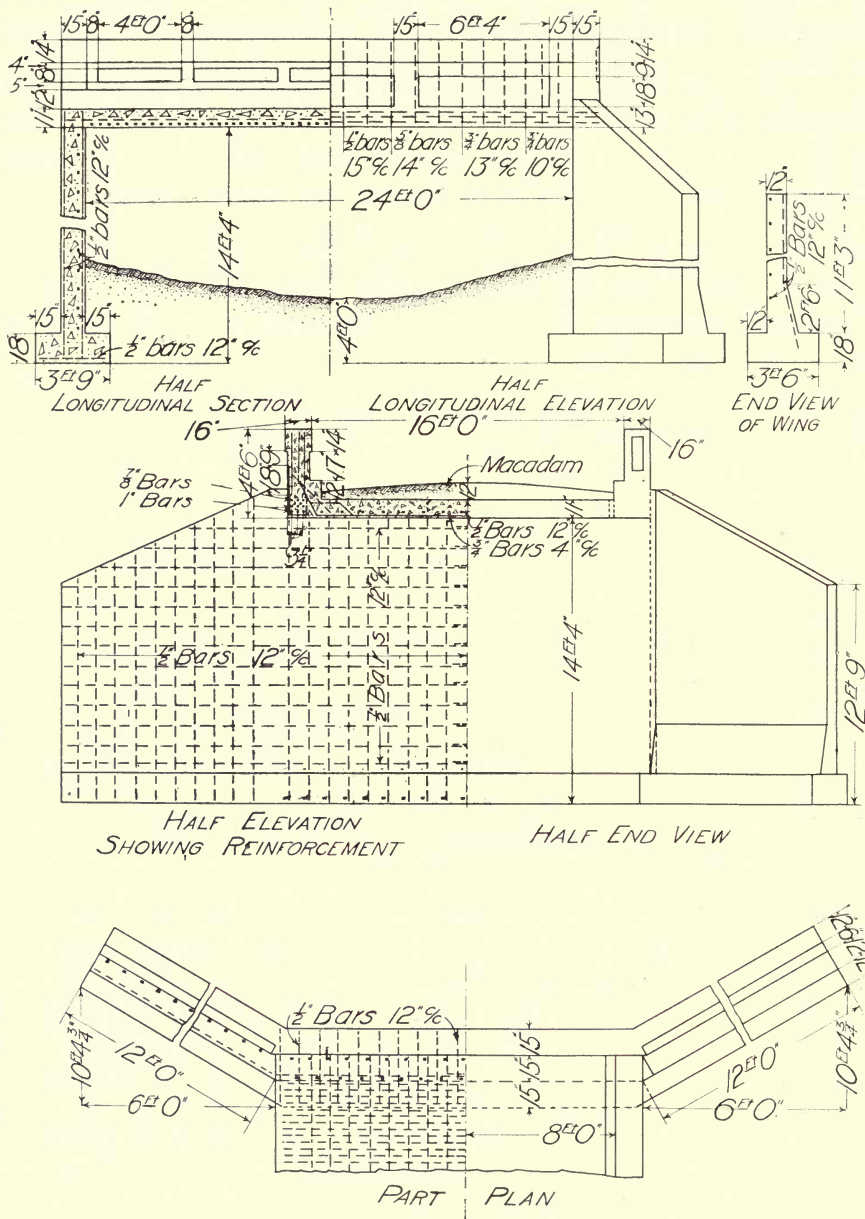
SLAB BRIDGE WITH SPAN OF 24 FEET.
